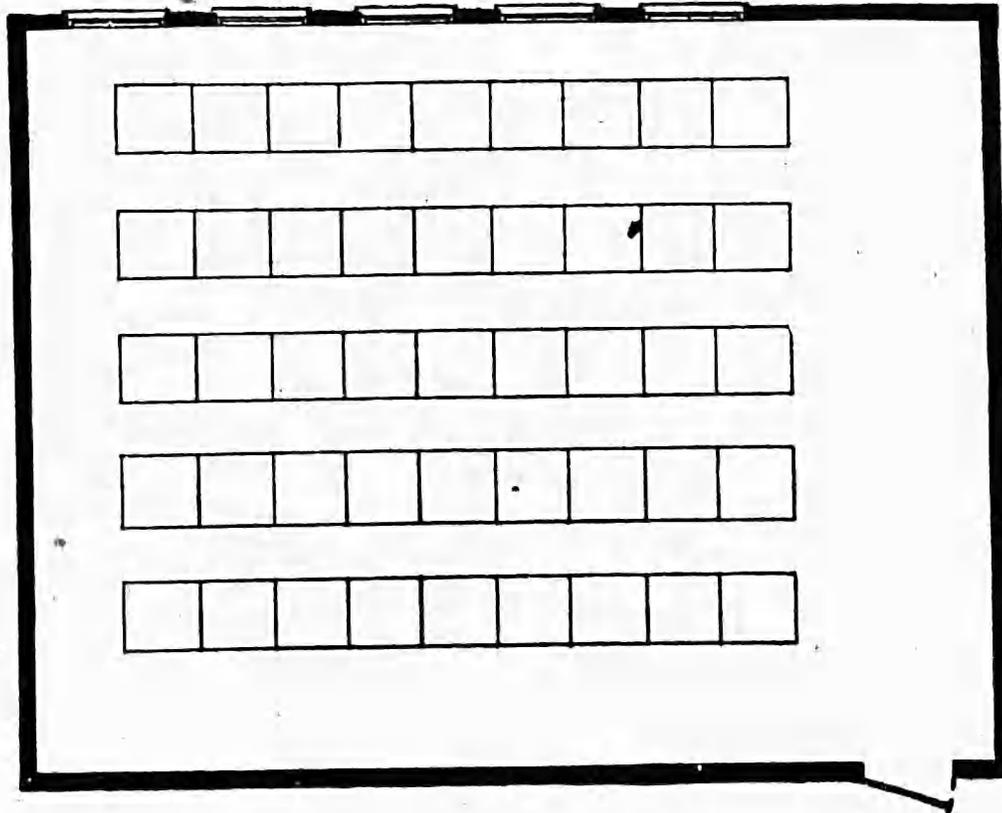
A schoolroom 22 by 30 feet, showing position of windows and desks, width of aisles, etc.
